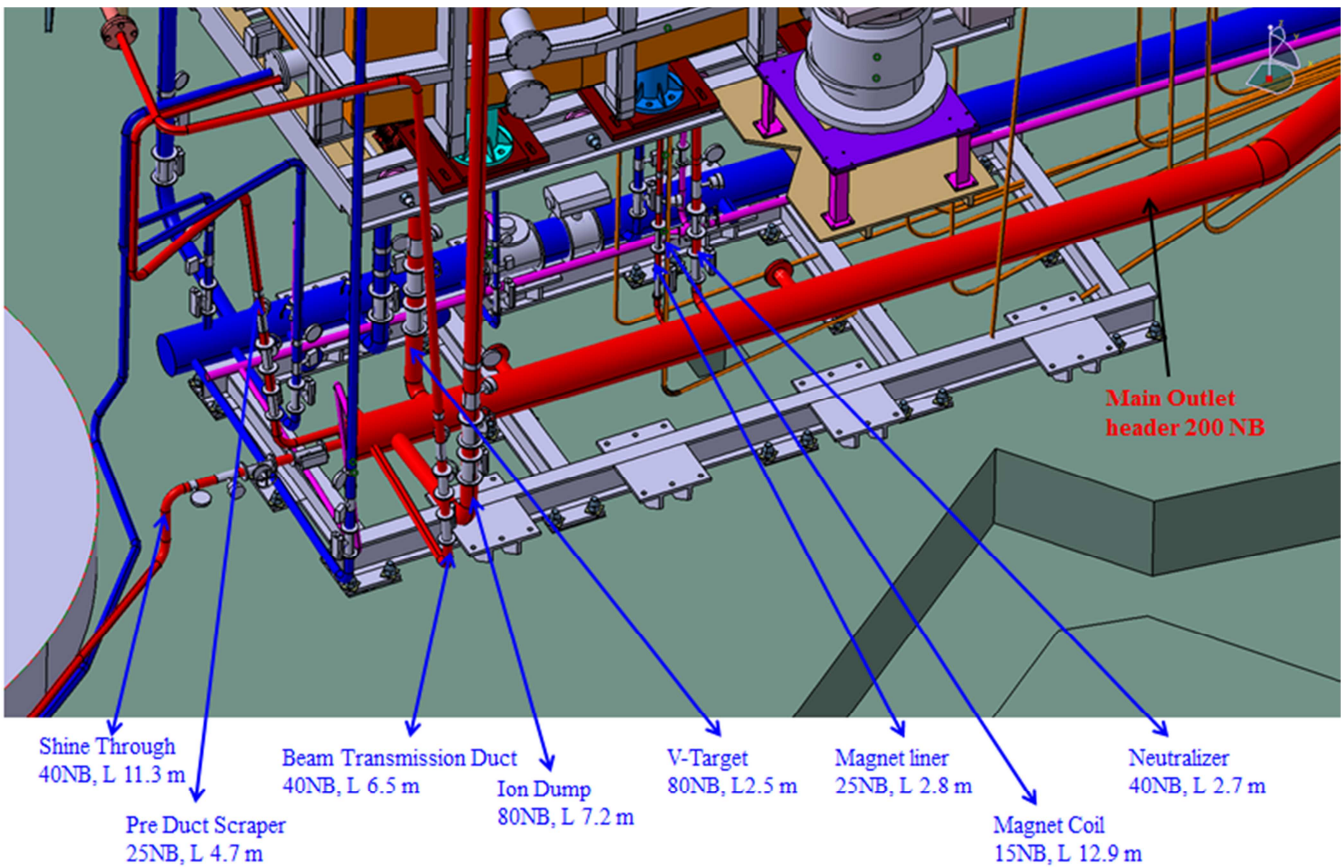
Three dimension view of piping layout of outlet of water cooling line connected to NBI sub-system
